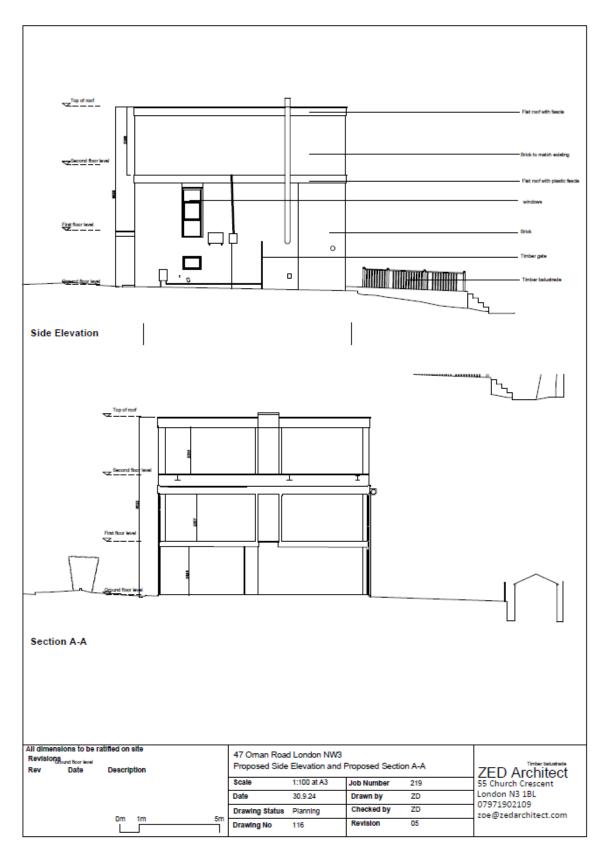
Proposed side elevation and section (Source: submitted drawings)
